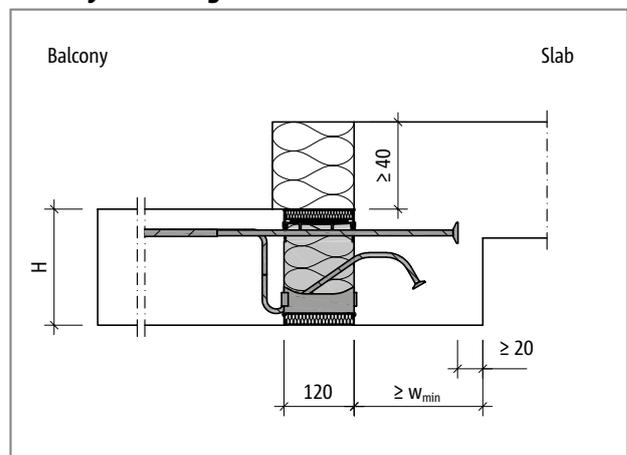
Schöck Isokorb® XT type K-U: Balcony with height offset downwards and external insulation
